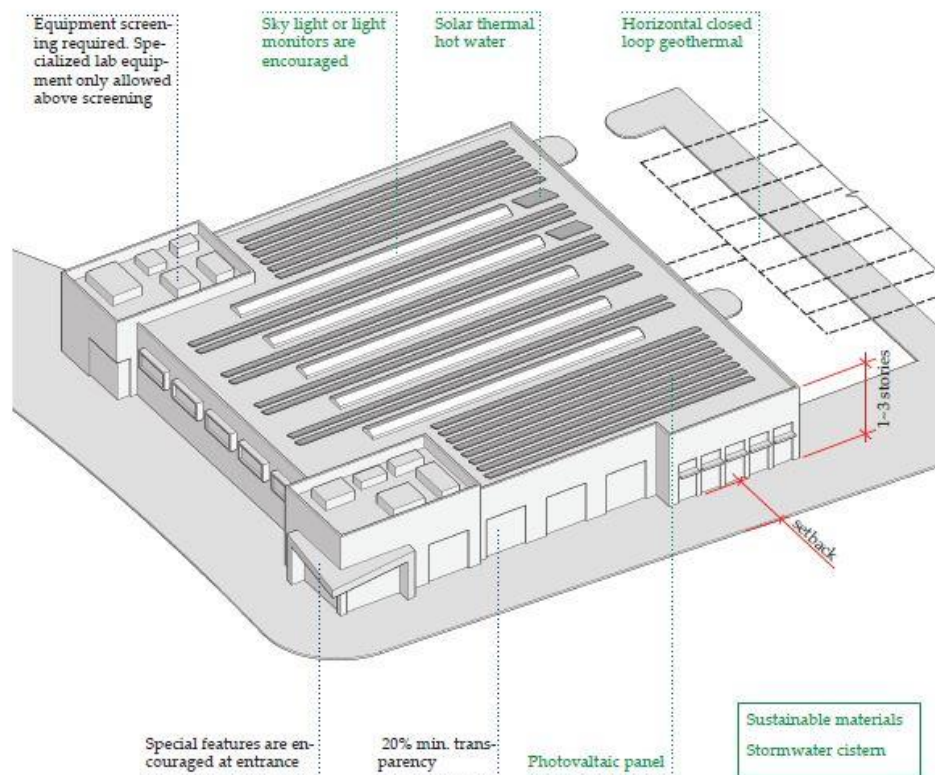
Laboratory buildout example, source: (EDAW Inc., 2009)
